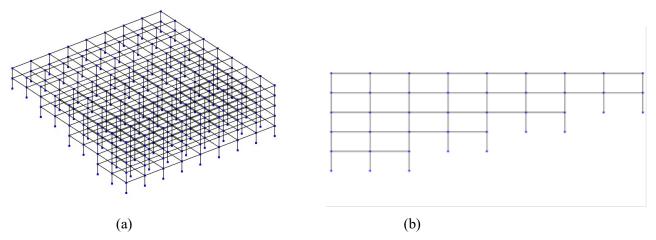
Isometric View (a) and Front Elevation (b) of Step-back Building
